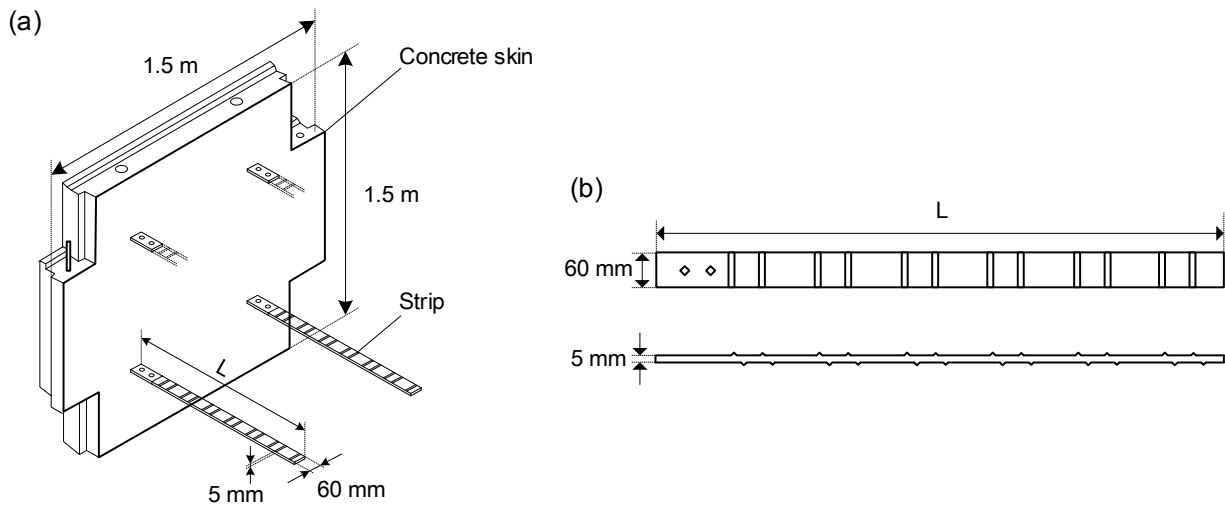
Shapes of (a) concrete skin and (b) strip in reinforcing earth wall (Public Works Research Center, 2014).
